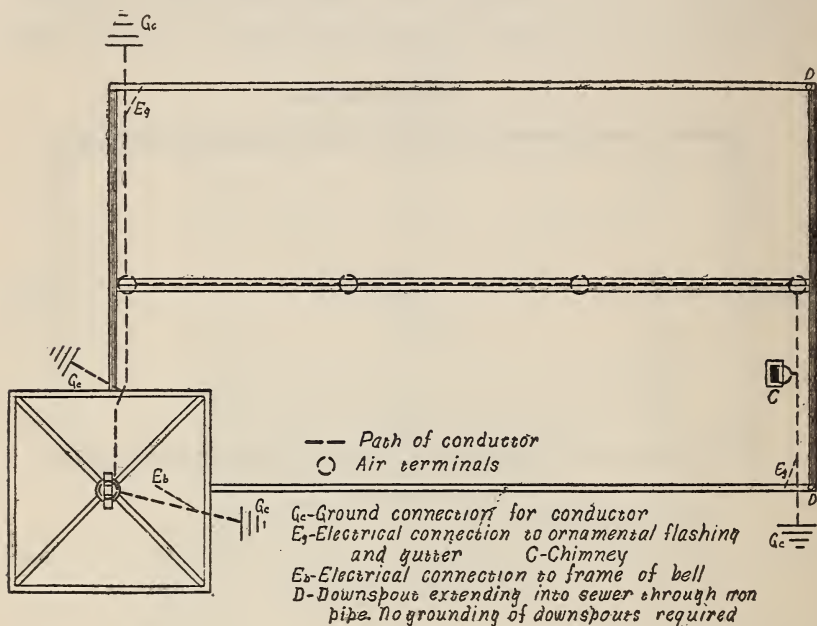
Roof plan of a church, showing installation of lightning rods with an electrical connection between rod and bell
